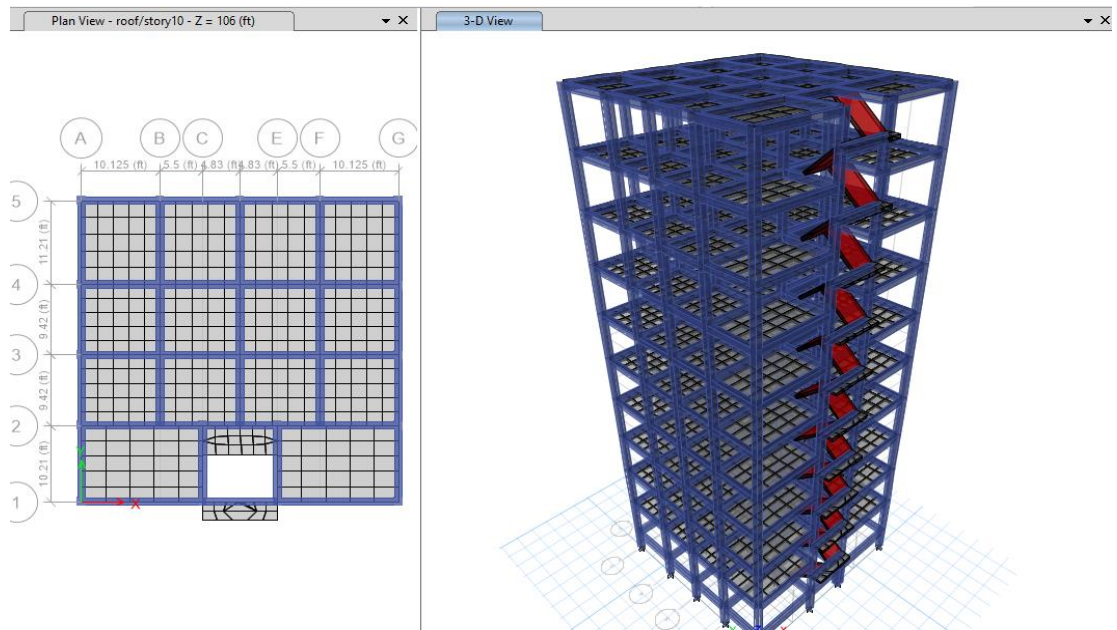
(G+10) story Residential Building plan view and 3D view
